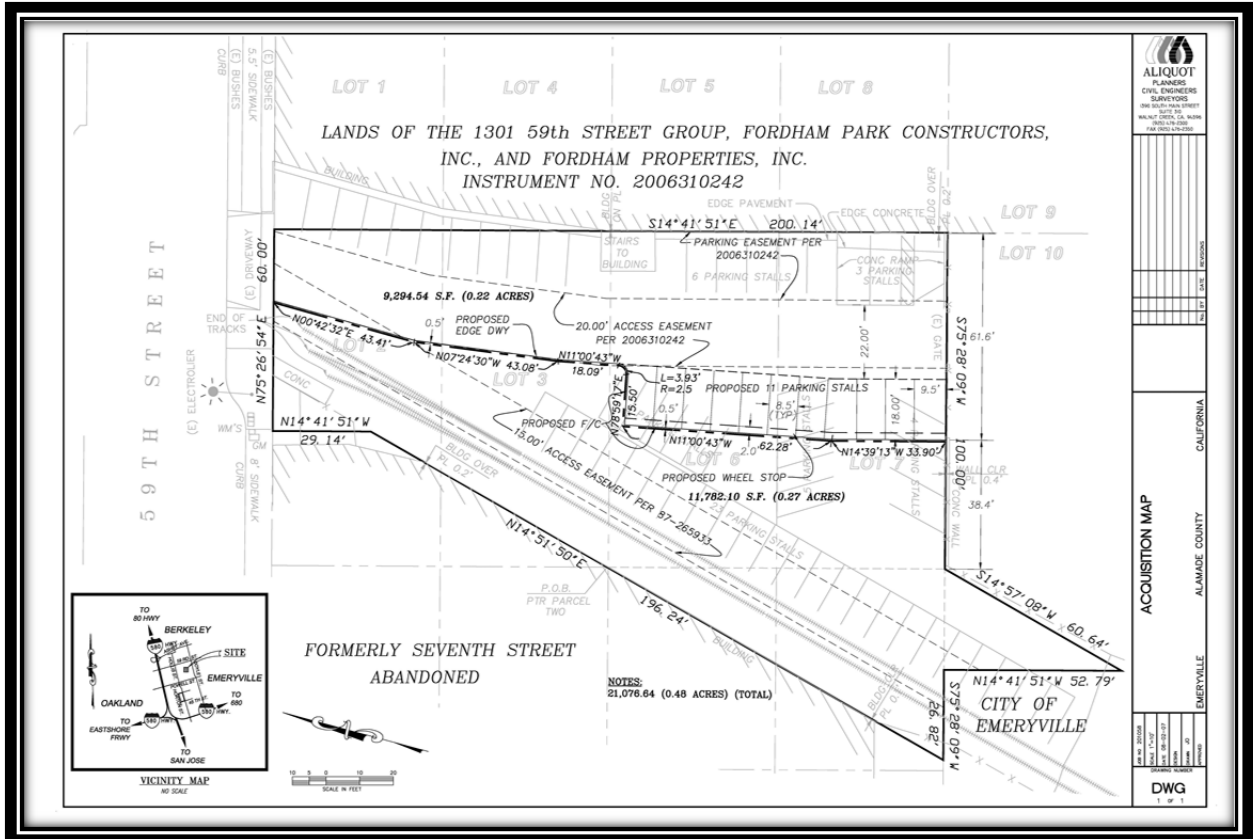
Thompson and Dorfman Site Plan - Sherwin Williams Site and Parcel D
